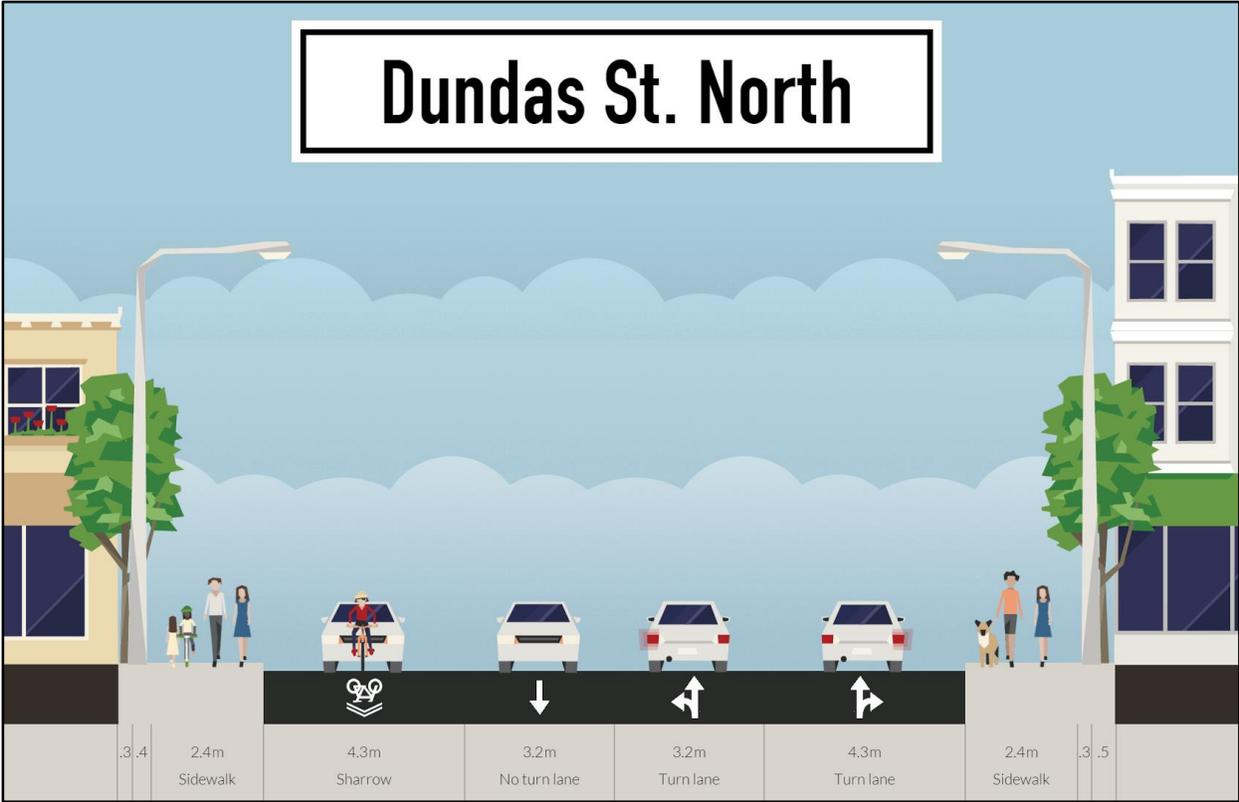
Cross-section of the proposed Dundas St. (North side) modifications (Figure 4(5)).
